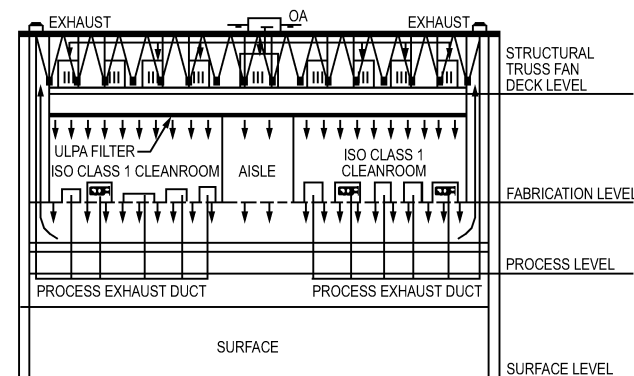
Building Truss Level is Arranged as Fan Deck and Air Plenum
